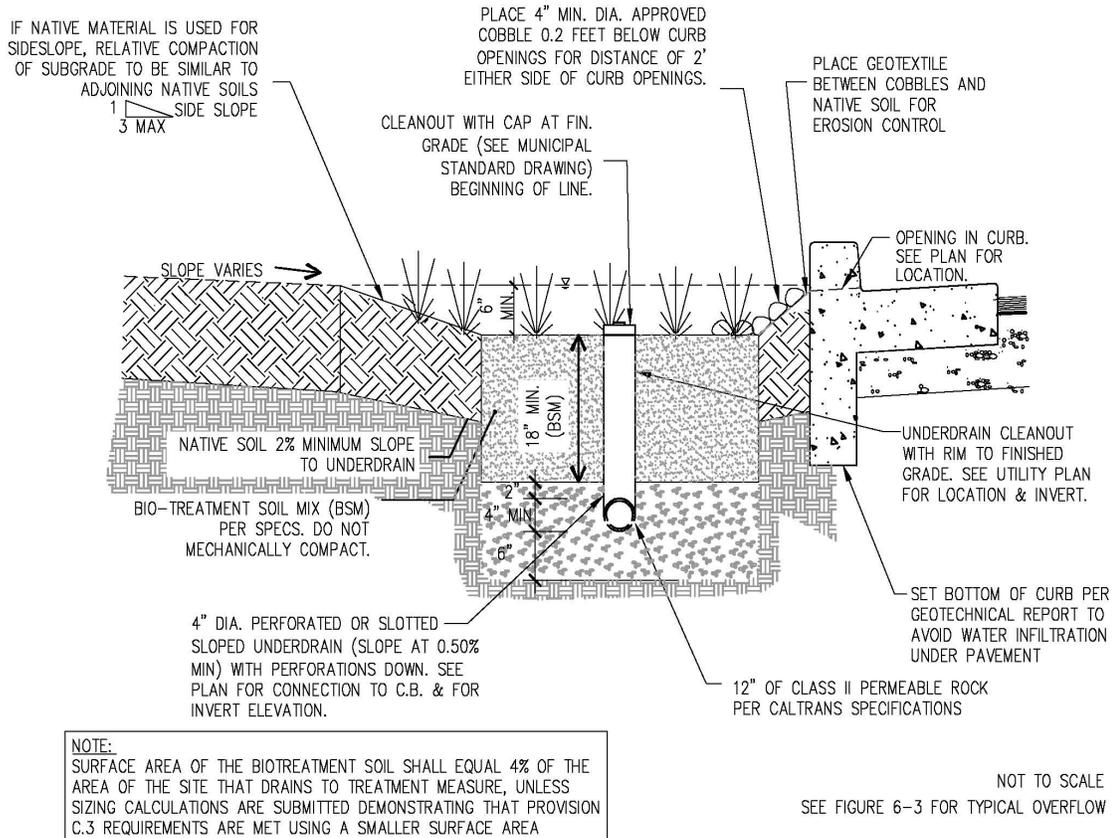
Cross section of bioretention area showing inlet from pavement.
